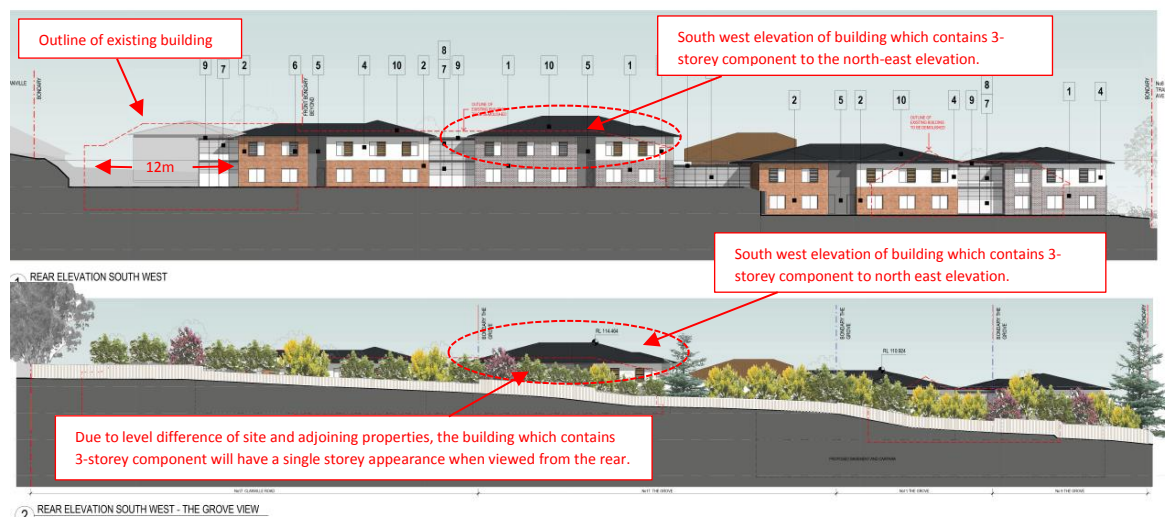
Rear (South West) Elevation and with existing and proposed planting. Source-Group GSA
